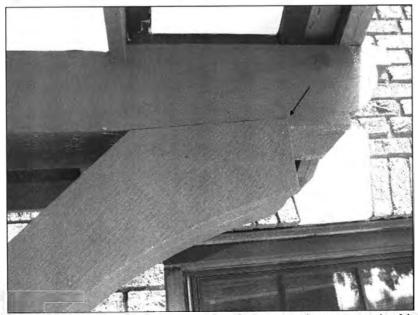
Restored east entry canopy bracket, arrow denotes mortised joint (same treatment is used at the bracket base), view east (Photo by James Jacobsen, June 2009)
